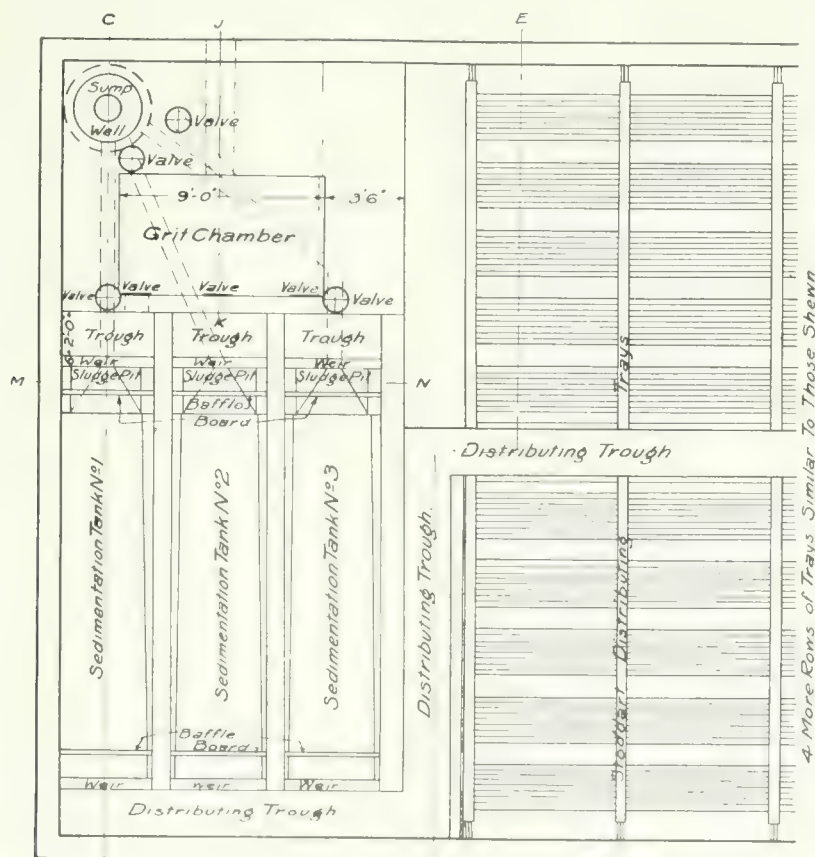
Plan of Part of Disposal Works Showing General Arrangement.
